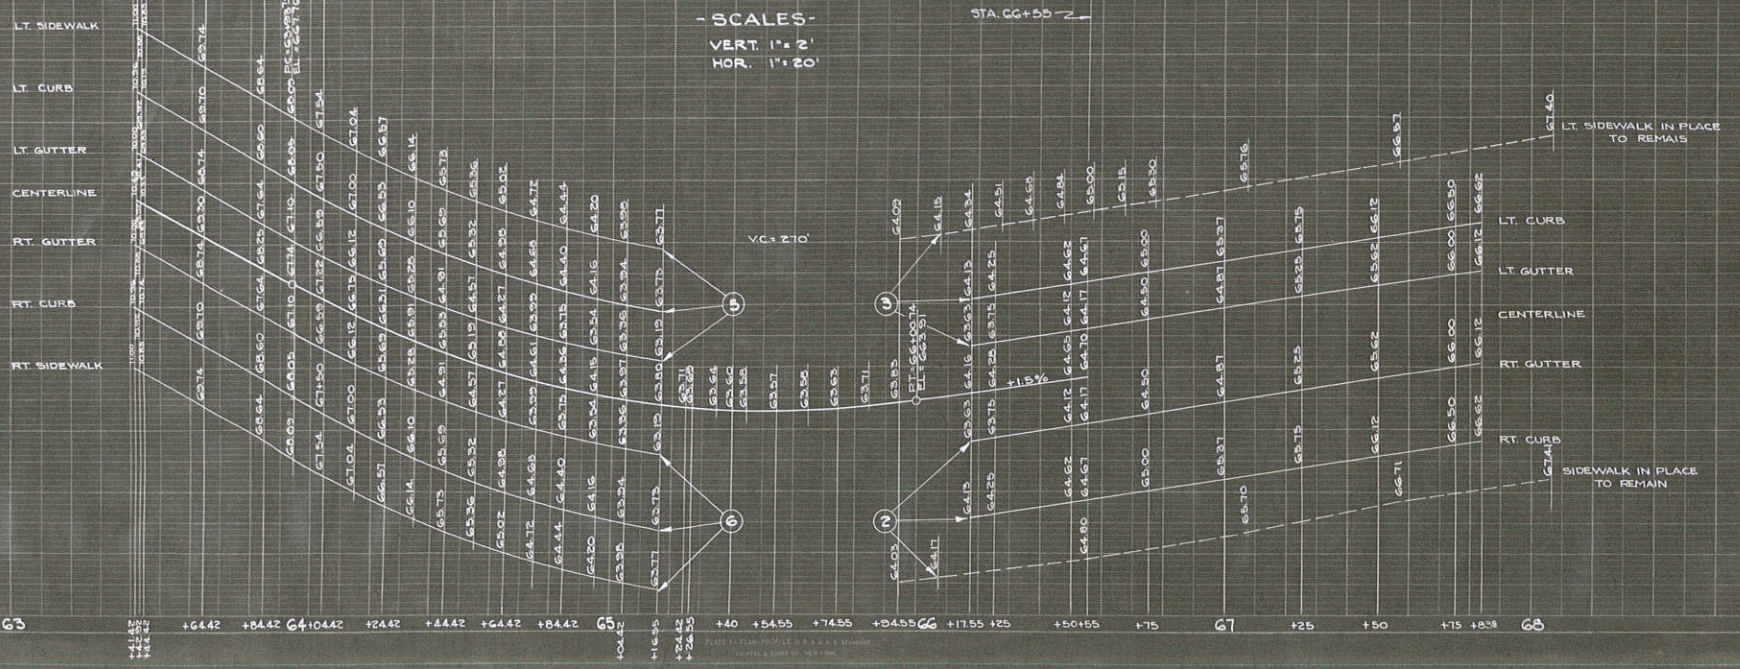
DETAILS ON CASS STREET WEST SIDE OF THIRD STREET
